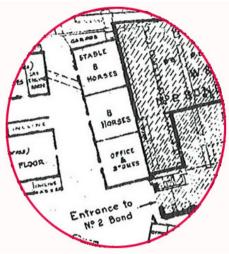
Stables Market – Site plan dated 9<sup>th</sup> February 1925.
